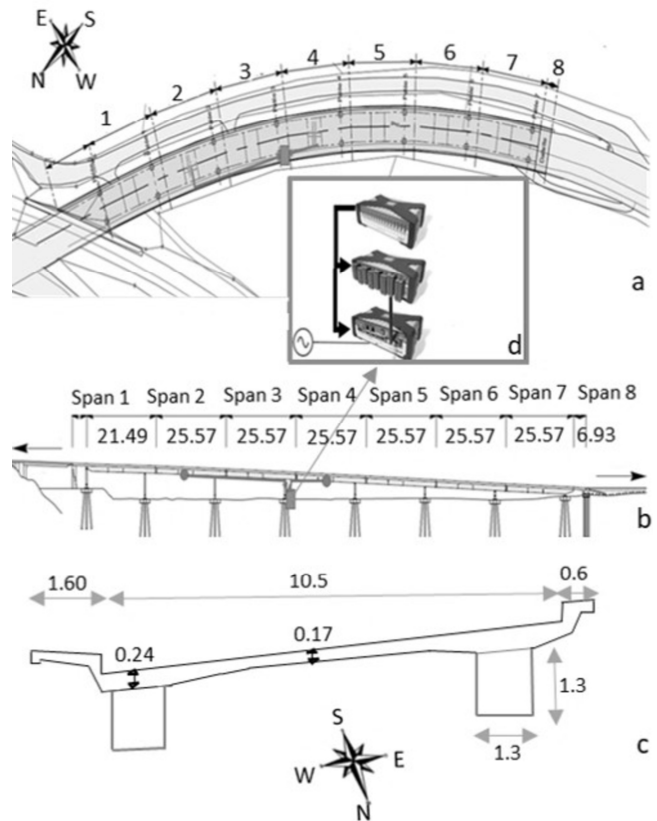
Drawing of the viaduct (a) plan view; (b) side view; (c) typical cross-section; (d) data acquisition and storage unit; dimensions in [m]
